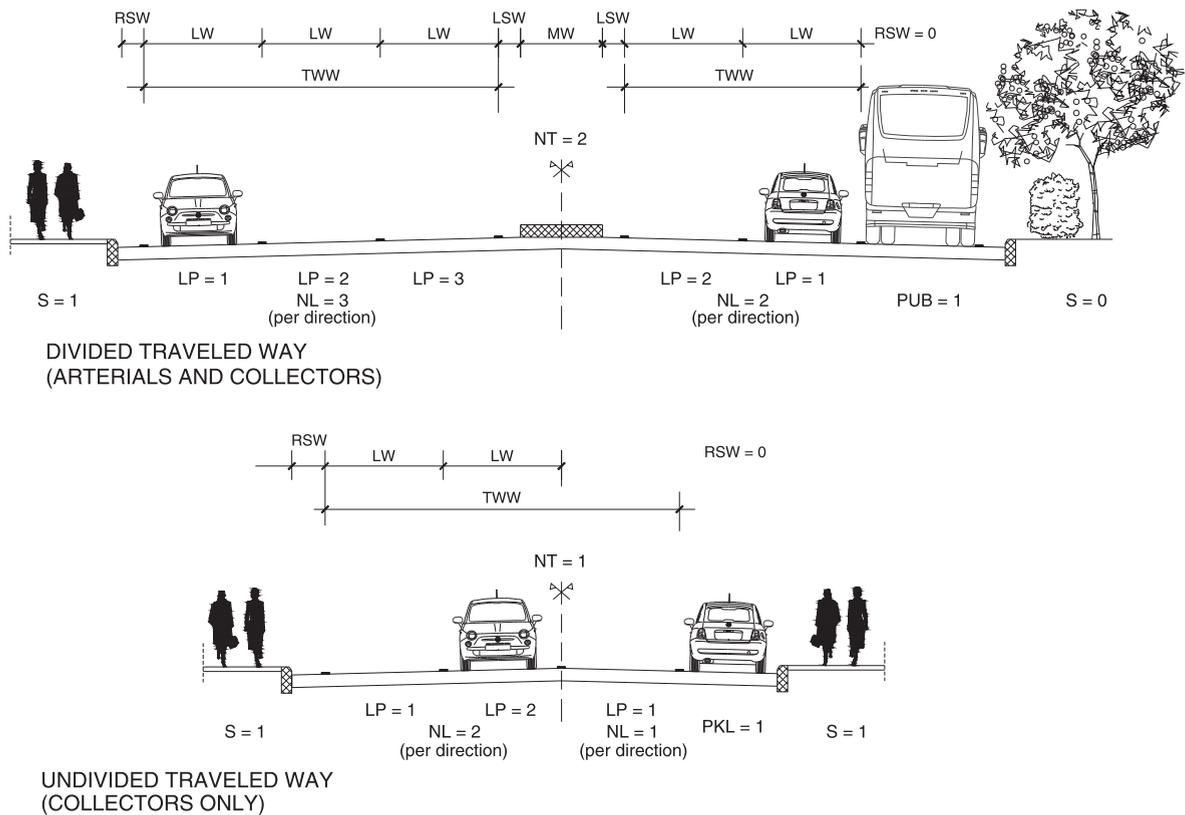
Transversal section parameters for divided and undivided travelled ways.
